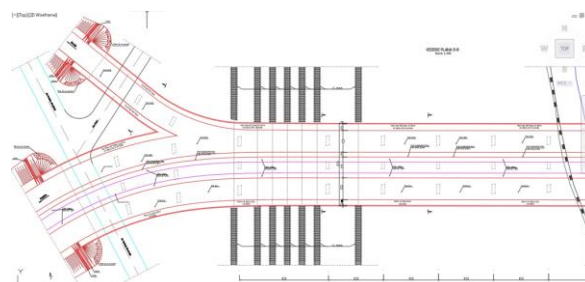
The location plan of the bridge in the Intim area that crosses the railway
